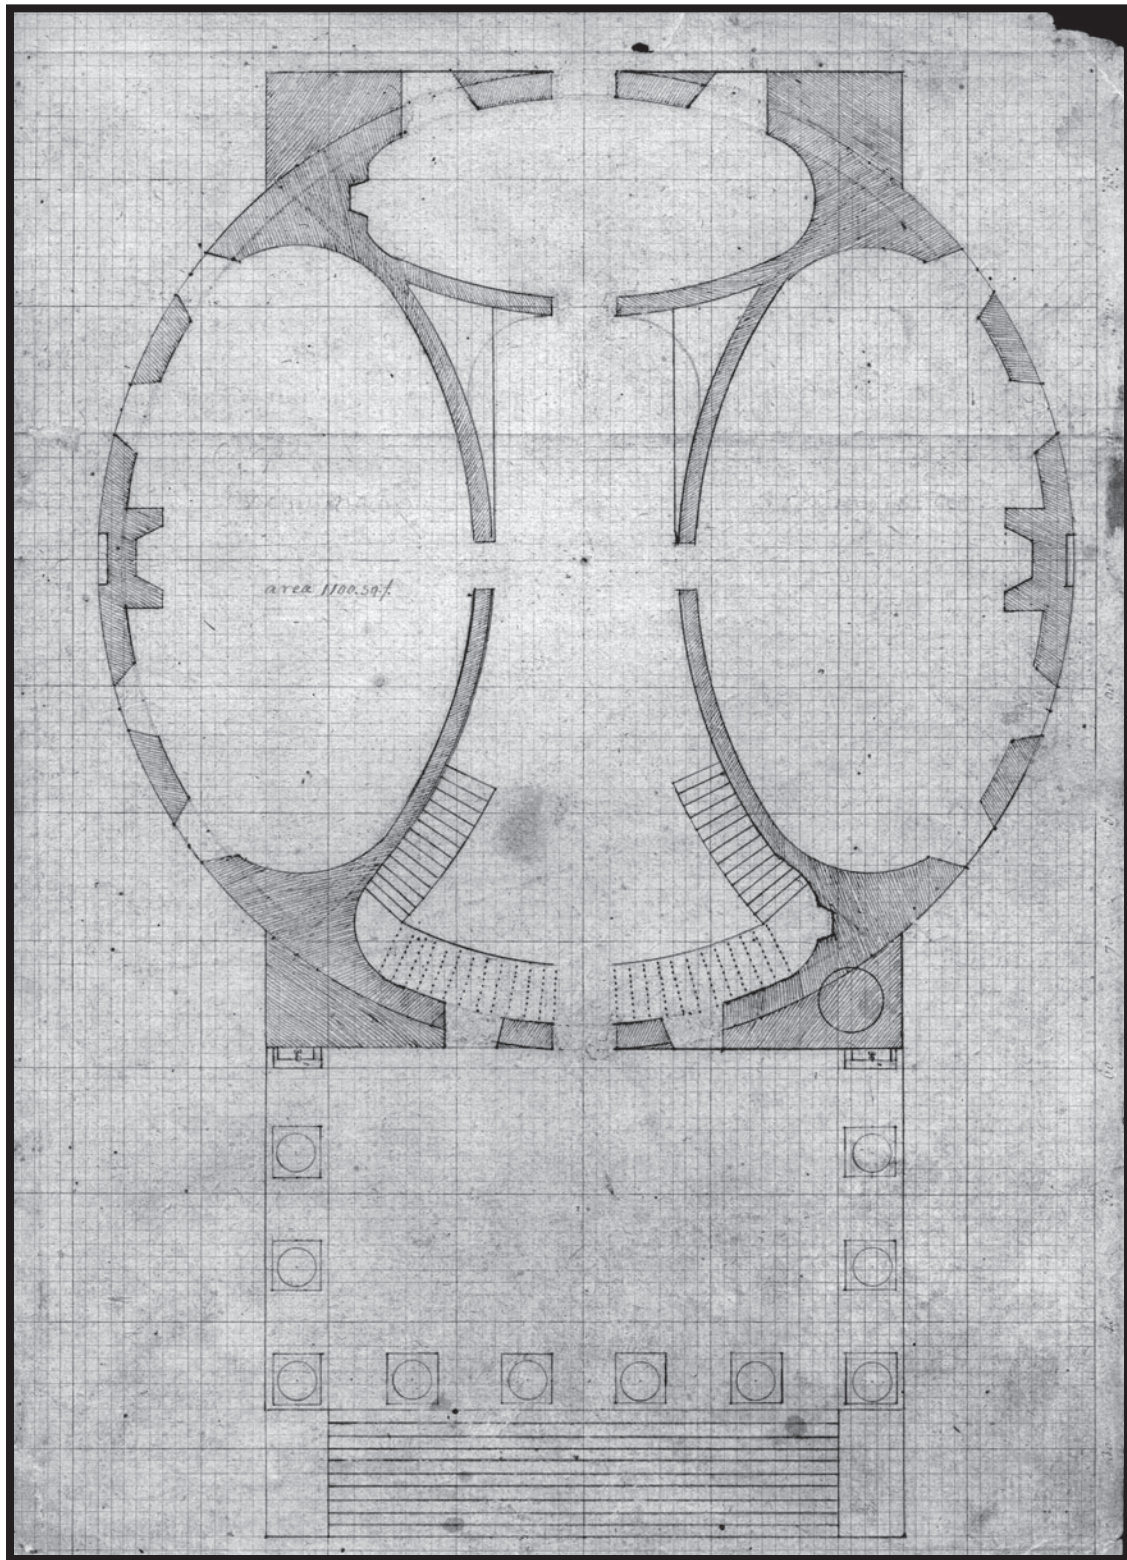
Thomas Jefferson, plan of main floor of the Rotunda, drawing begun 1818, completed by March 29, 1819.
